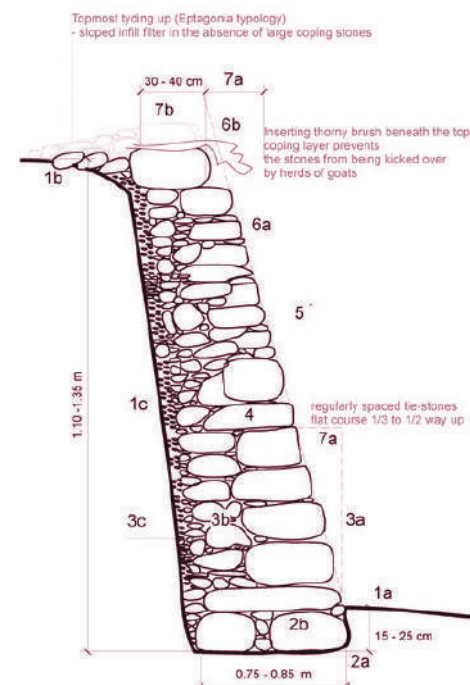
Drystone wall section detail, Sevina Floridou.⁴
